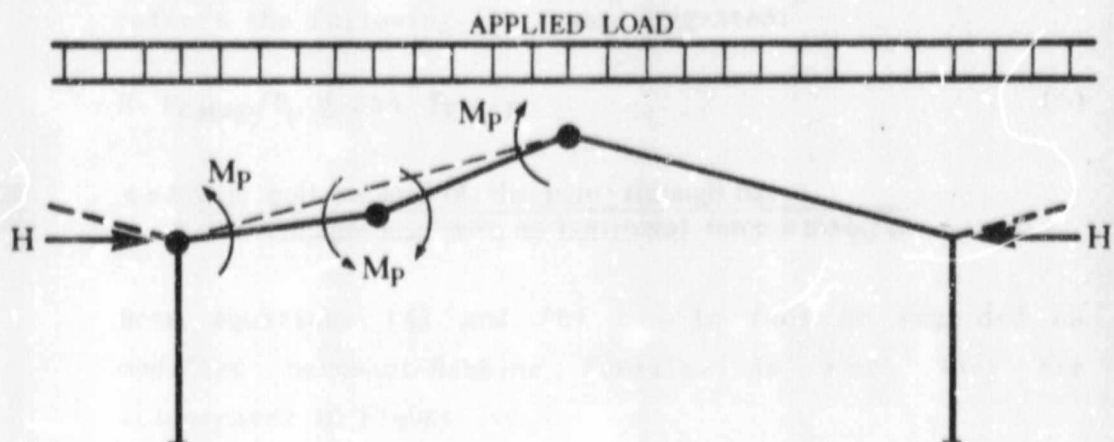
DESIGN OF RAFTERS AS FIXED ENDED BEAMS BY UTILISING ARCHING ACTION
